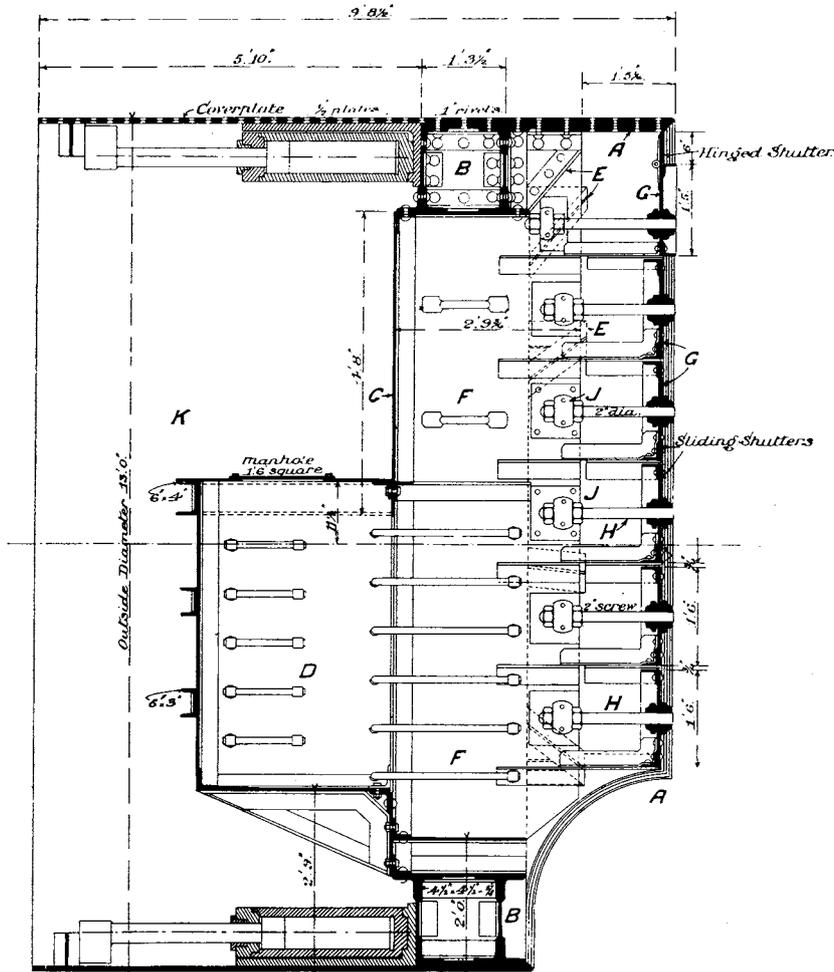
BAKER STREET AND WATERLOO RAILWAY, LONDON.
